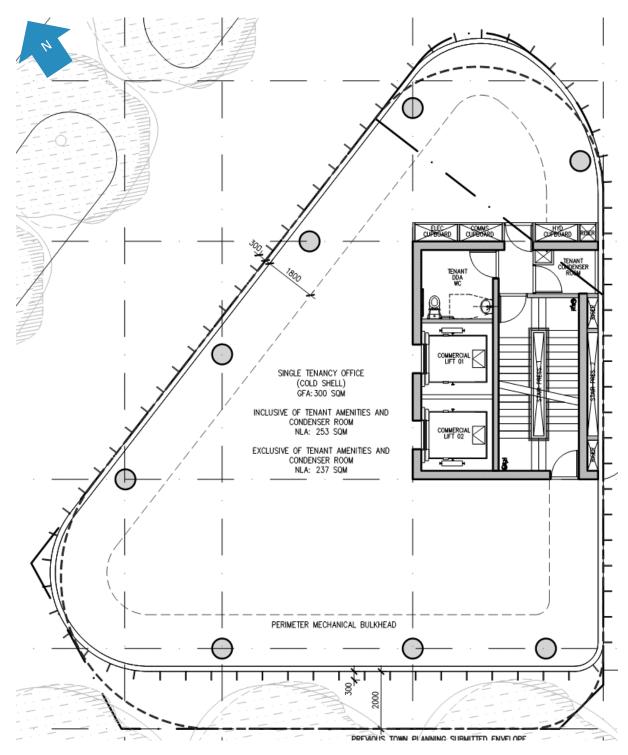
Proposed Floor Plans – Level 1 to Level 4 (Image Source: Elenberg Fraser)
